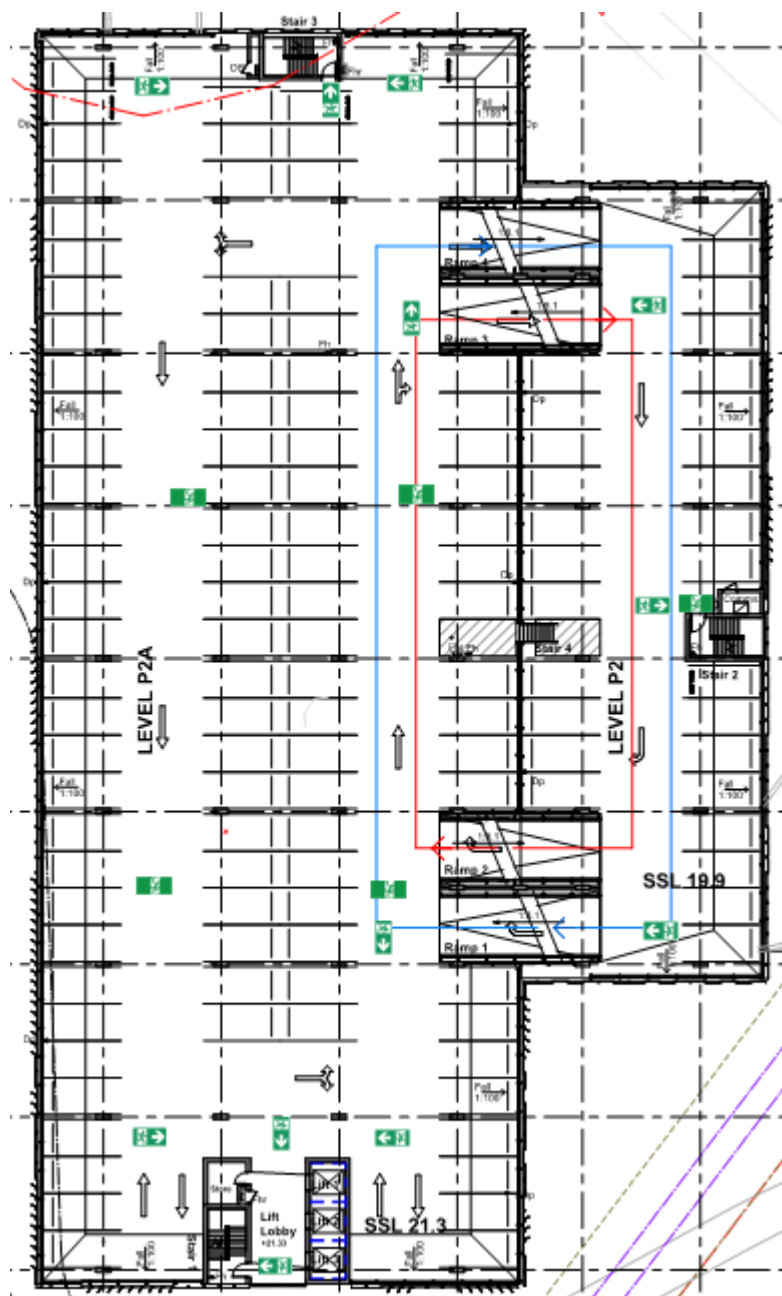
Indicative exit sign locations on a typical car park storey
